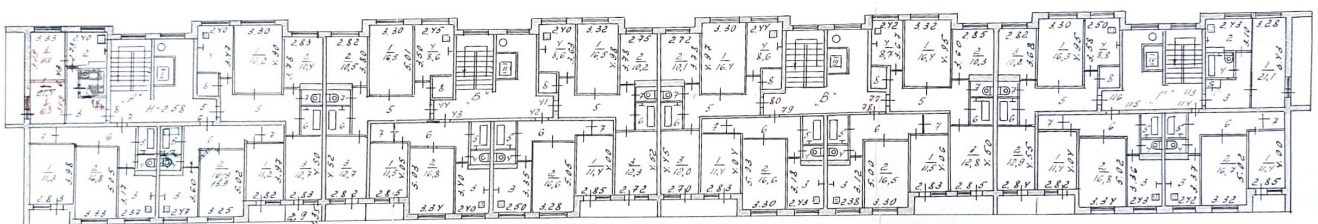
Series 83, str. Tul'skaya 21 (city centre). Floor plan <sup>[32]</sup>
